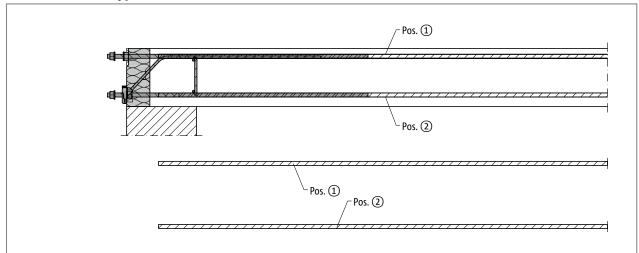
Schöck Isokorb® T type SK-MM1: On-site reinforcement: Cross section
